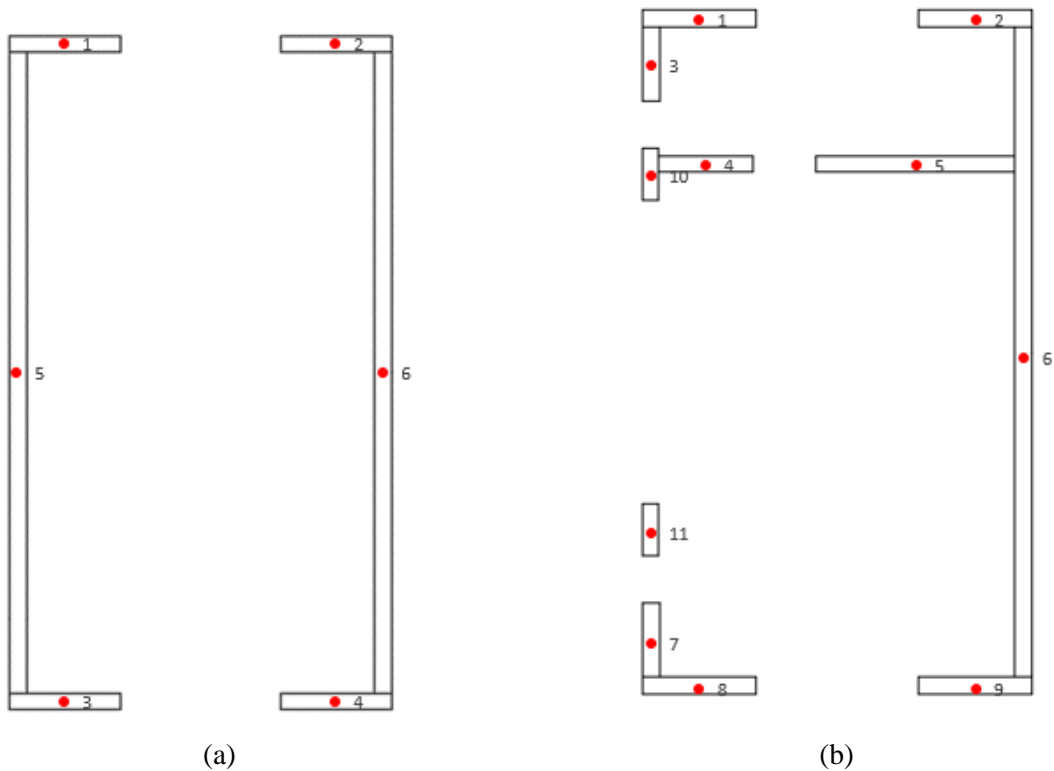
Right building. (a) Ground floor, non-verified walls:10,11; (b) first floor, non-verified walls:5,6.
